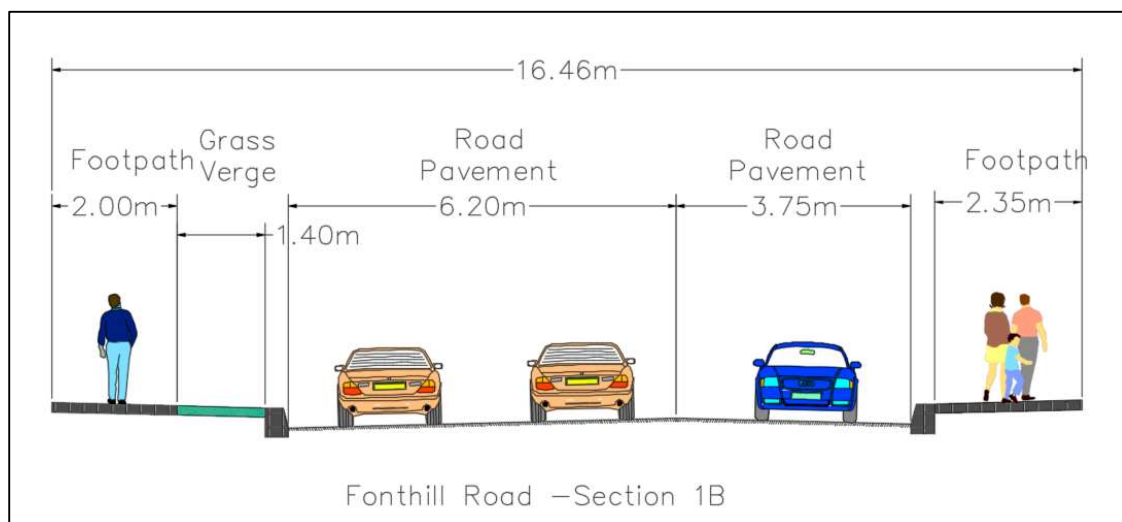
Existing Cross-section 1B (Fonthill Road)
